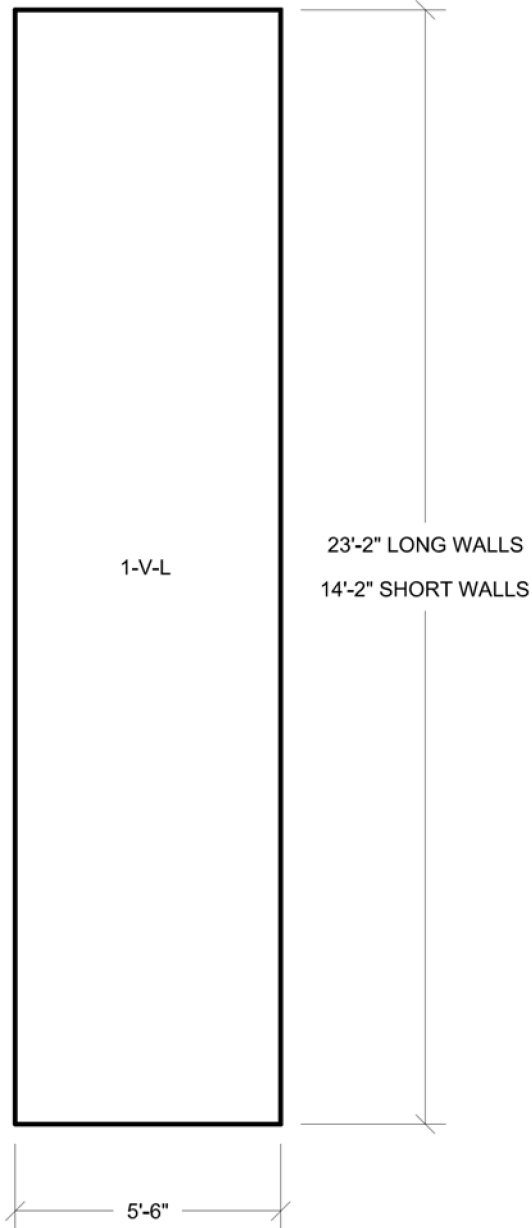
H.7-10 Access Region Walls Looking From Outside Vertical Reinforcement Zones Near Side and Far Side Faces
